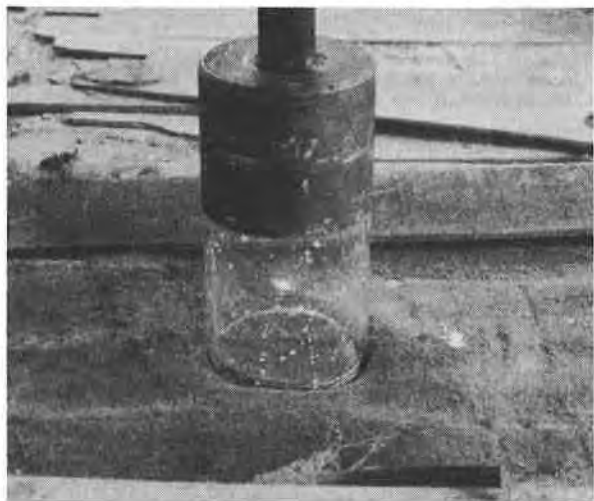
A plexiglass sampling tube is pressed through the geotextile into the ground.
